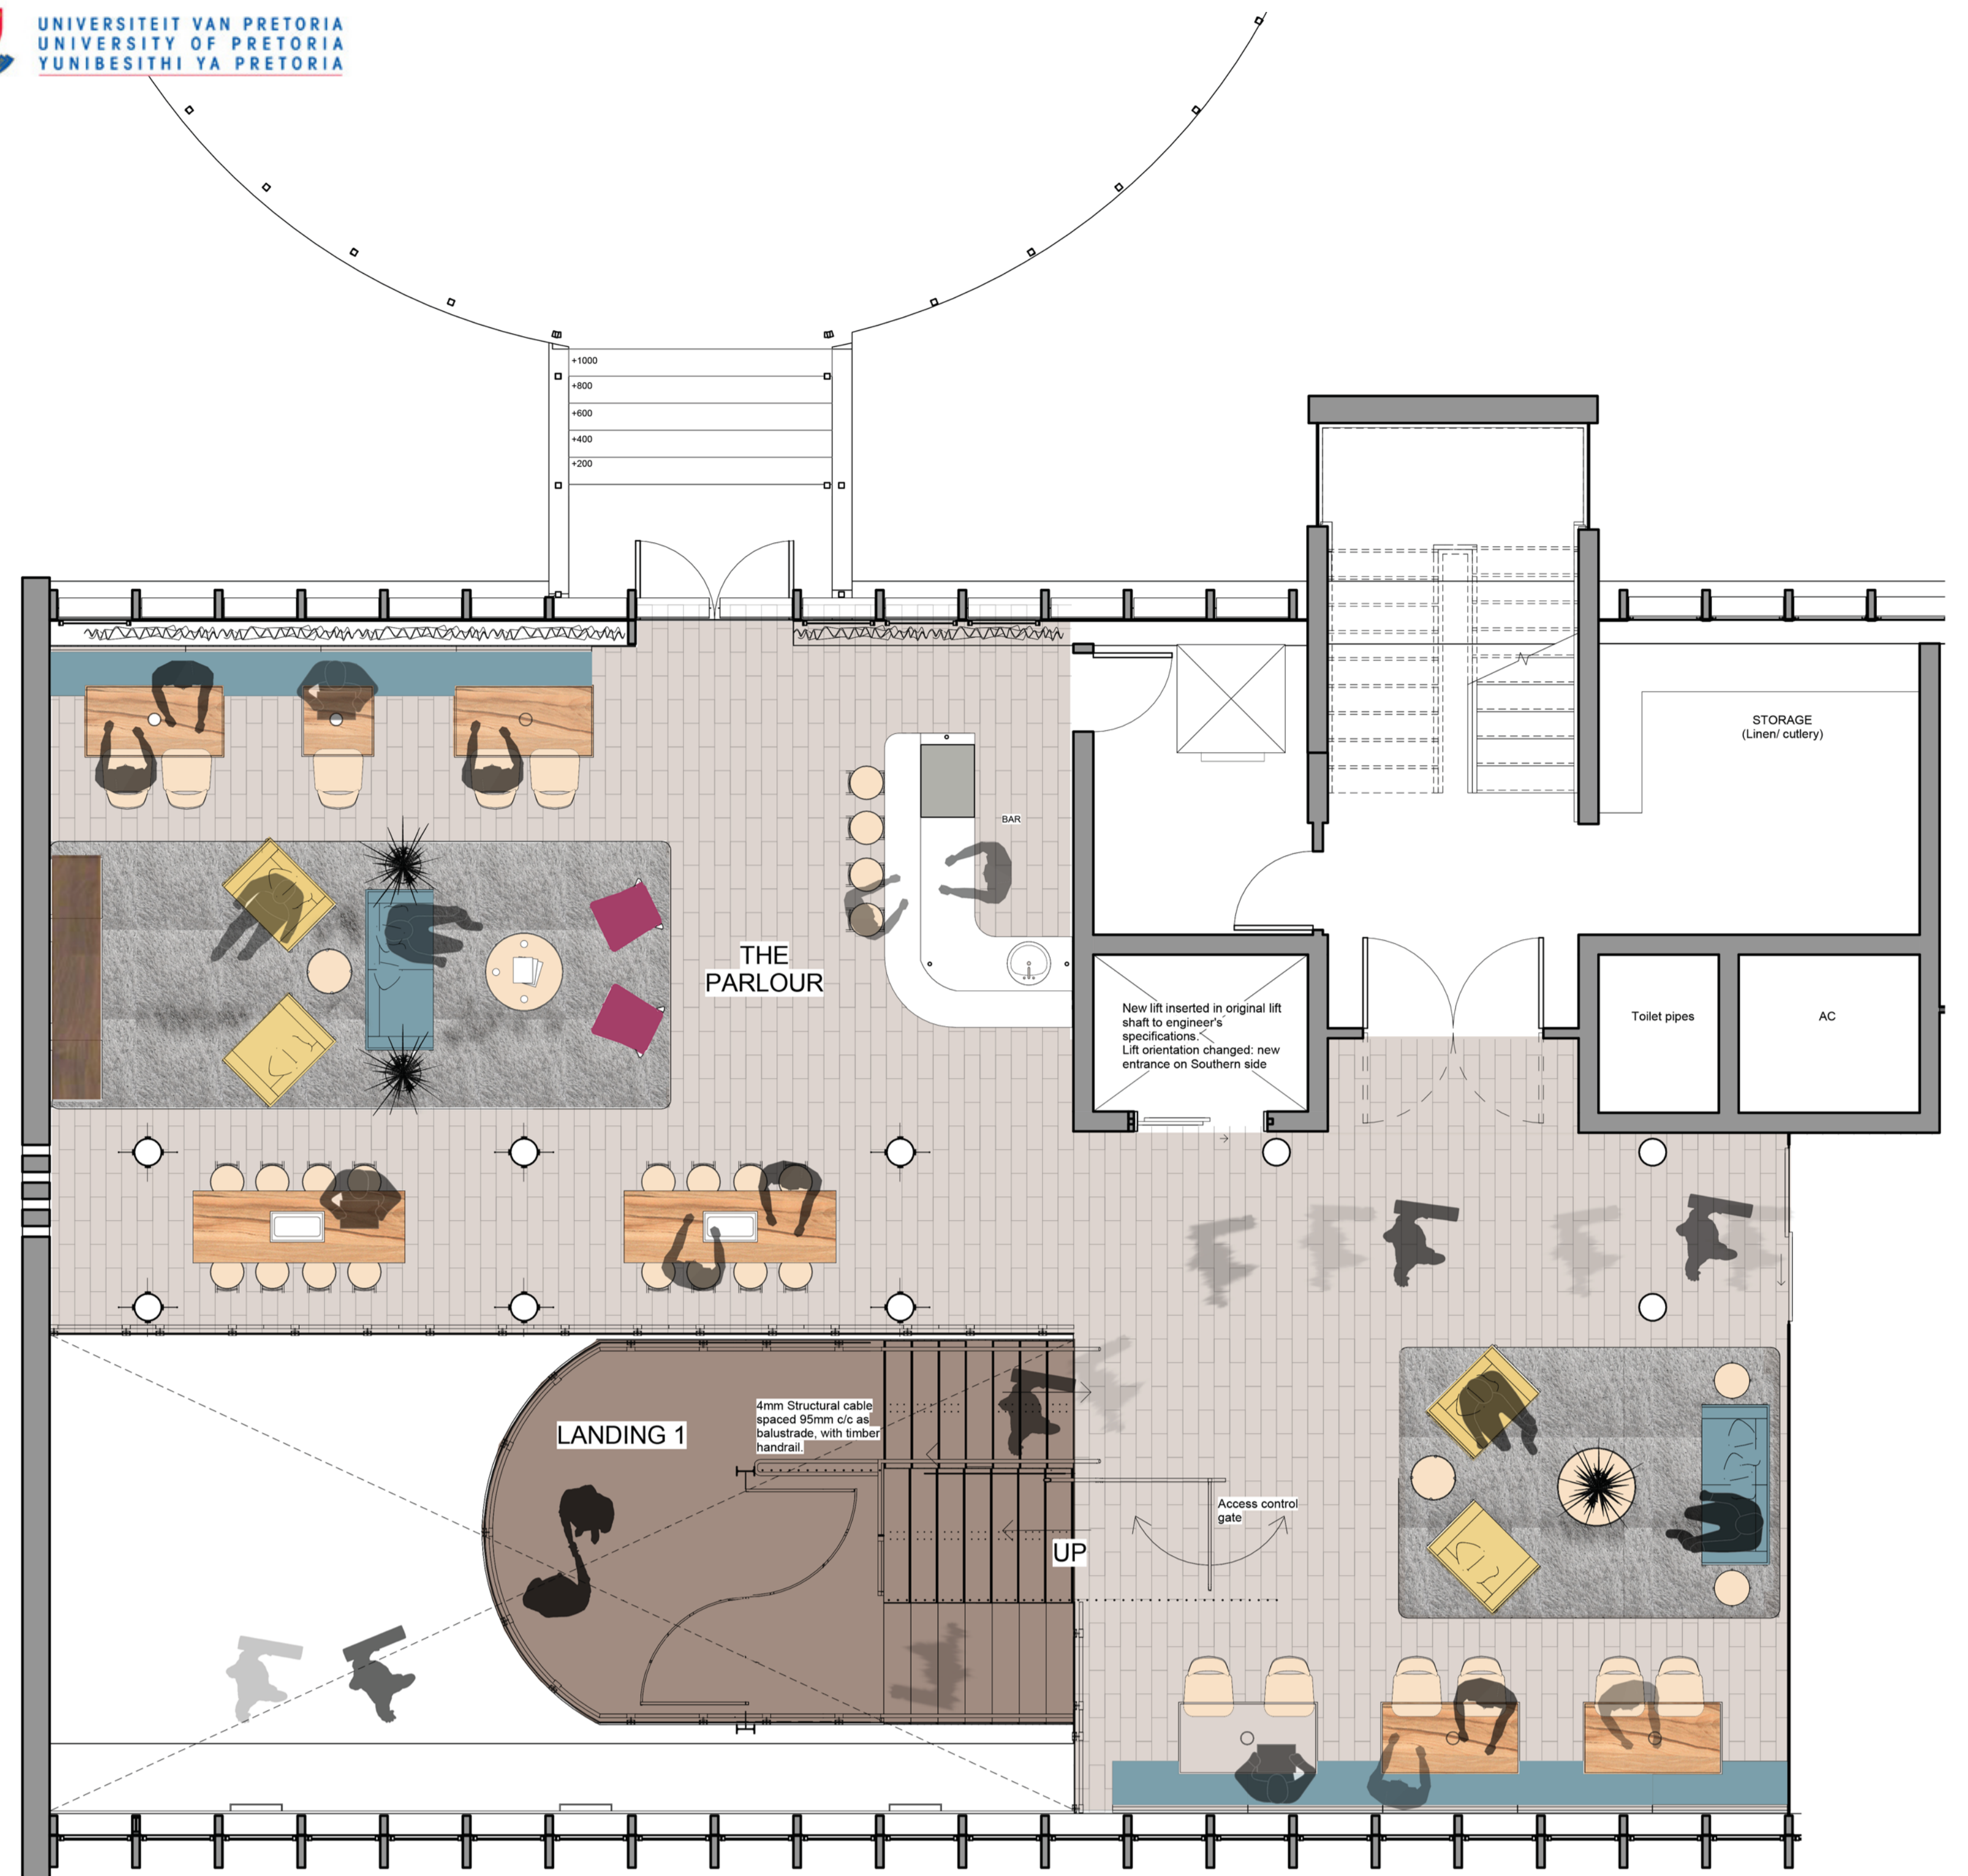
THE PARLOUR DETAIL PLAN SCALE 1:50
